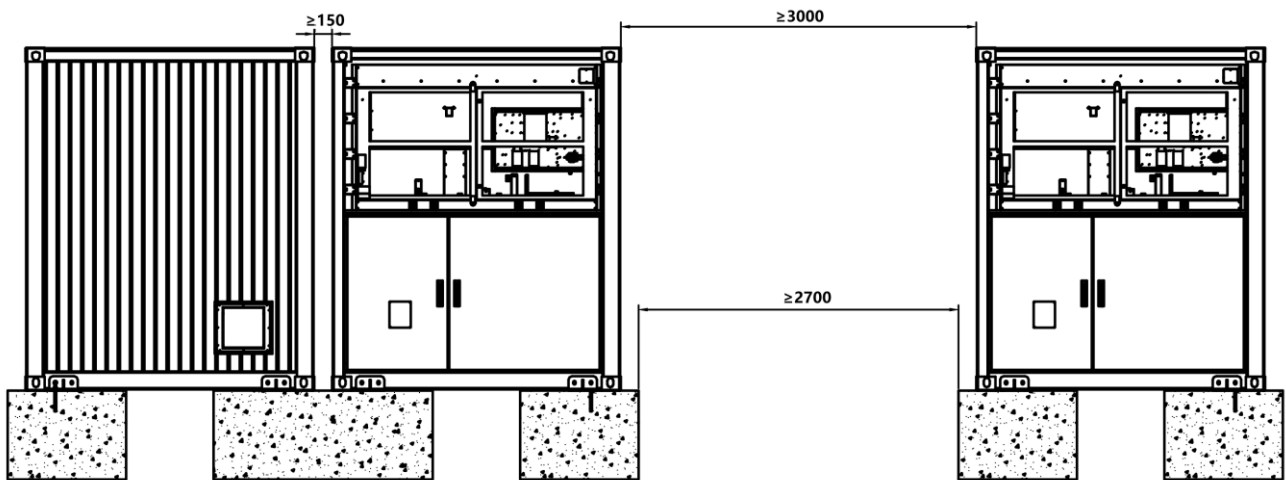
Left View of Installation Foundation (Unit: mm)
